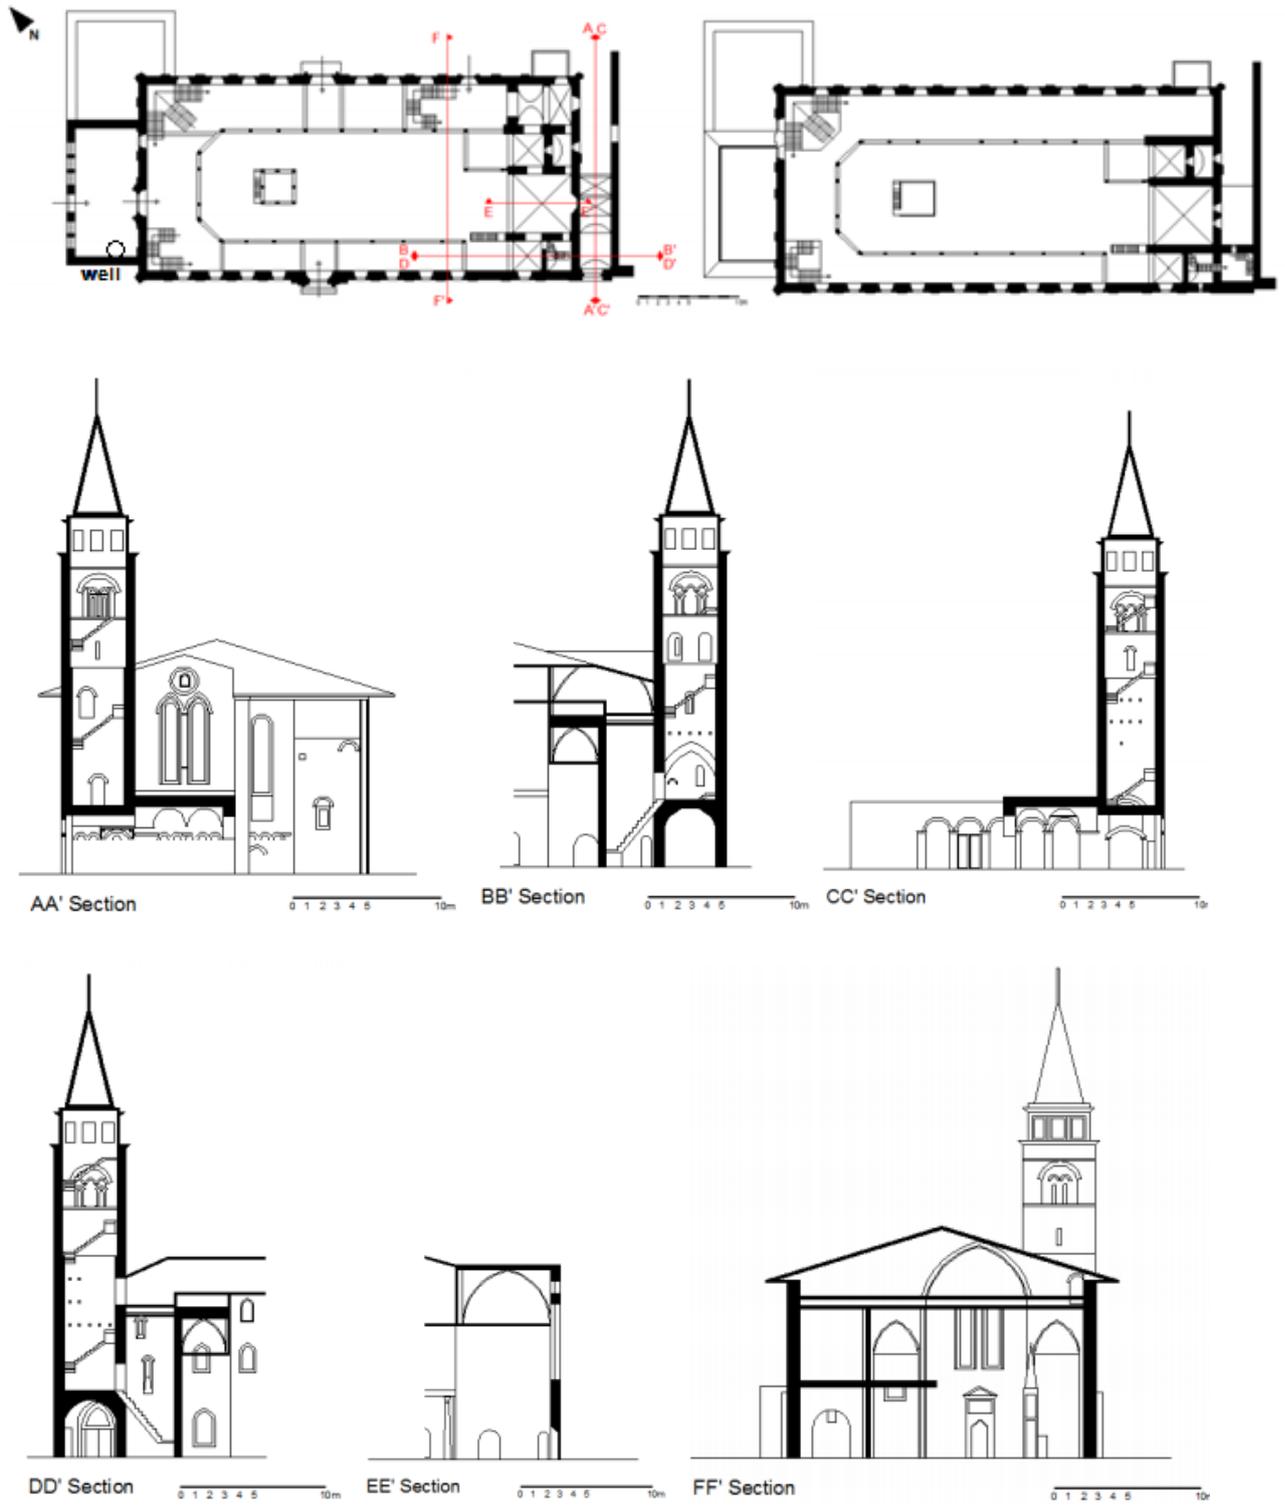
Schematic floor plans and sections of Arap Mosque (Author, 2015)
